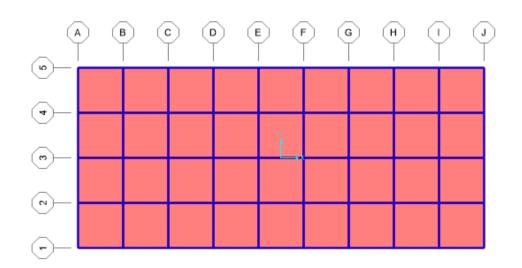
(a) plan of setback model 2(rectangular type) up to 45m height
